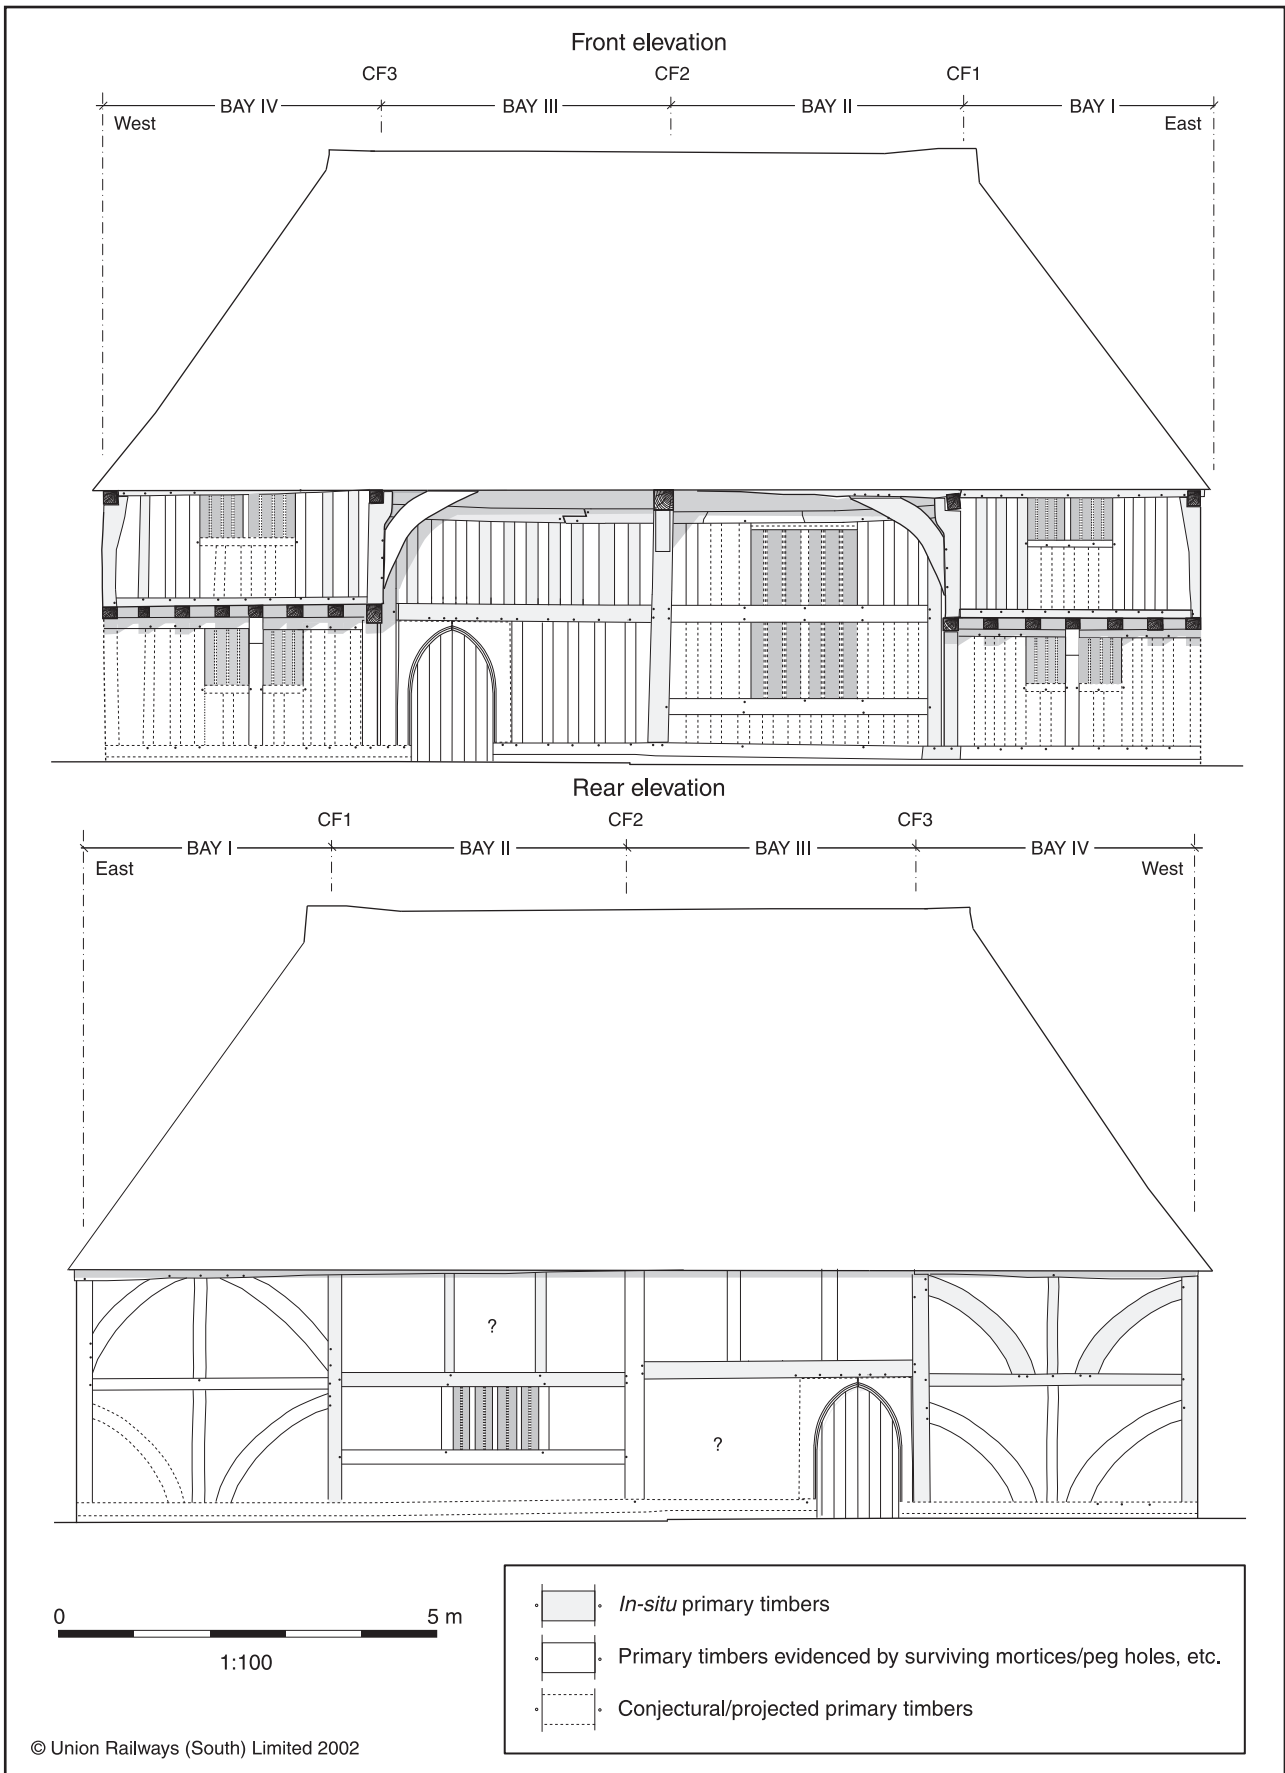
Talbot House: reconstructed principal elevations in Phase I
